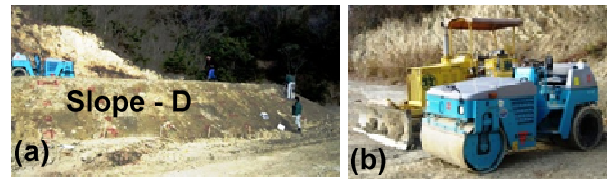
(a) Constructed embankment slope (b) Sheep foot roller and excavator
